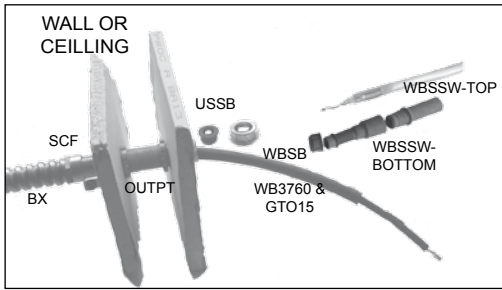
Slide WB3760 and GTO cable assembly into the OUTPT. Make sure you have 6" of this assembly standing out front for electrode connection.
